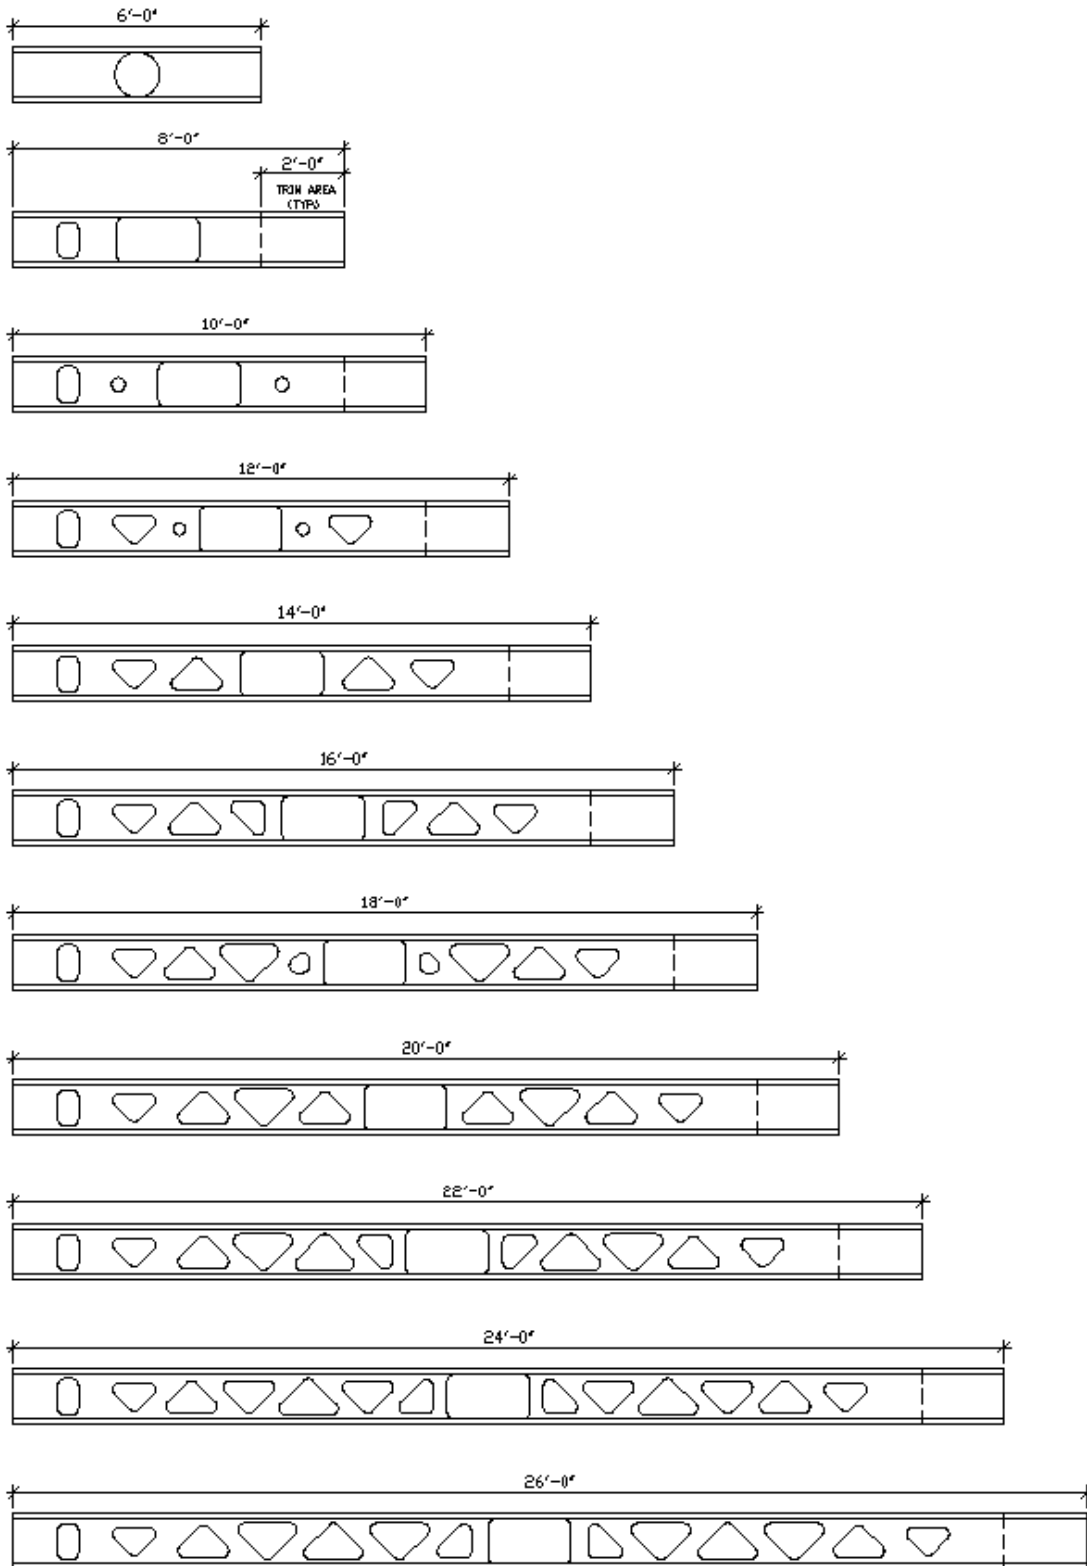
XJ 85® Wood I Beam™ Joist Layout Details
